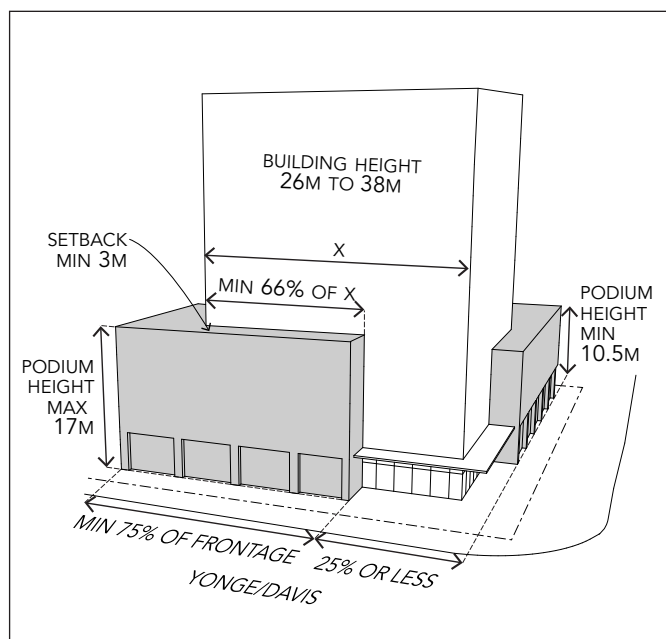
Podium Street Frontage, minimum and maximum Height and Setback for buildings greater than 26 metres but less than 38 metres.
